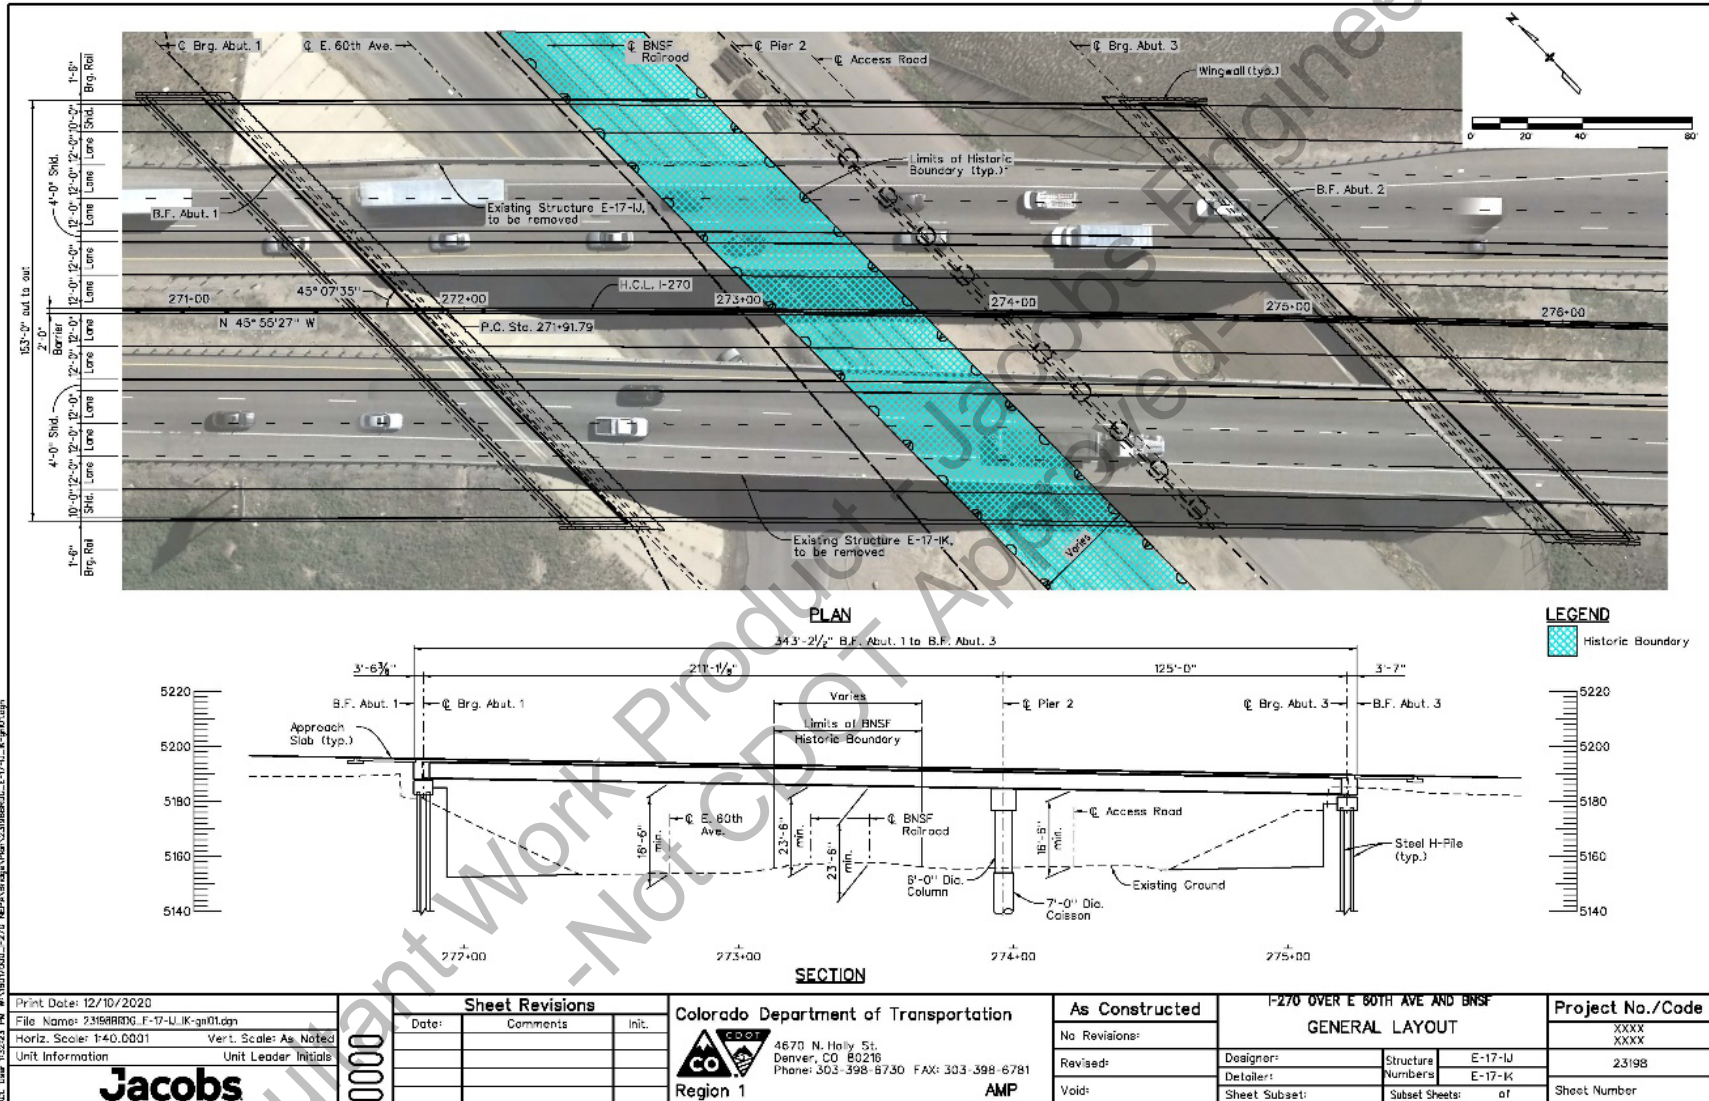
The plan view and cross section for the proposed improvements indicate the limits of the historic boundary of the CBQ Market Street Line segment (in blue) and the replacement bridge that would span the historic boundaries, with piers placed outside of the historic boundary.
